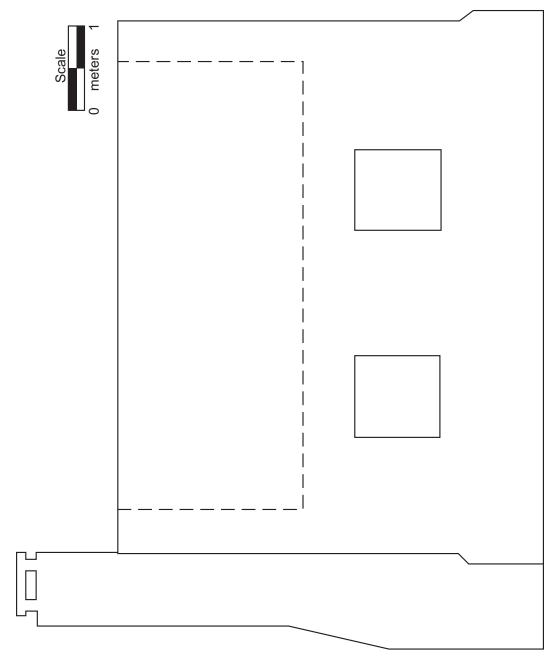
Elevation of southwest exterior side of stone structure at Rancho El Saladito.
